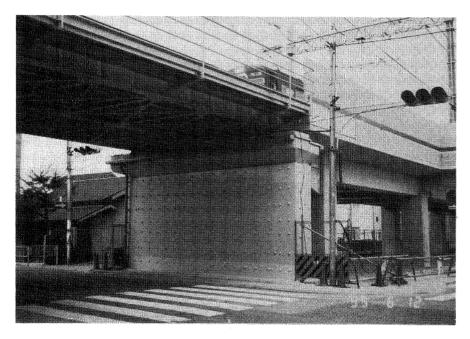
Hankyu Railway - Steel Jacketing of Existing Bridge Pier
